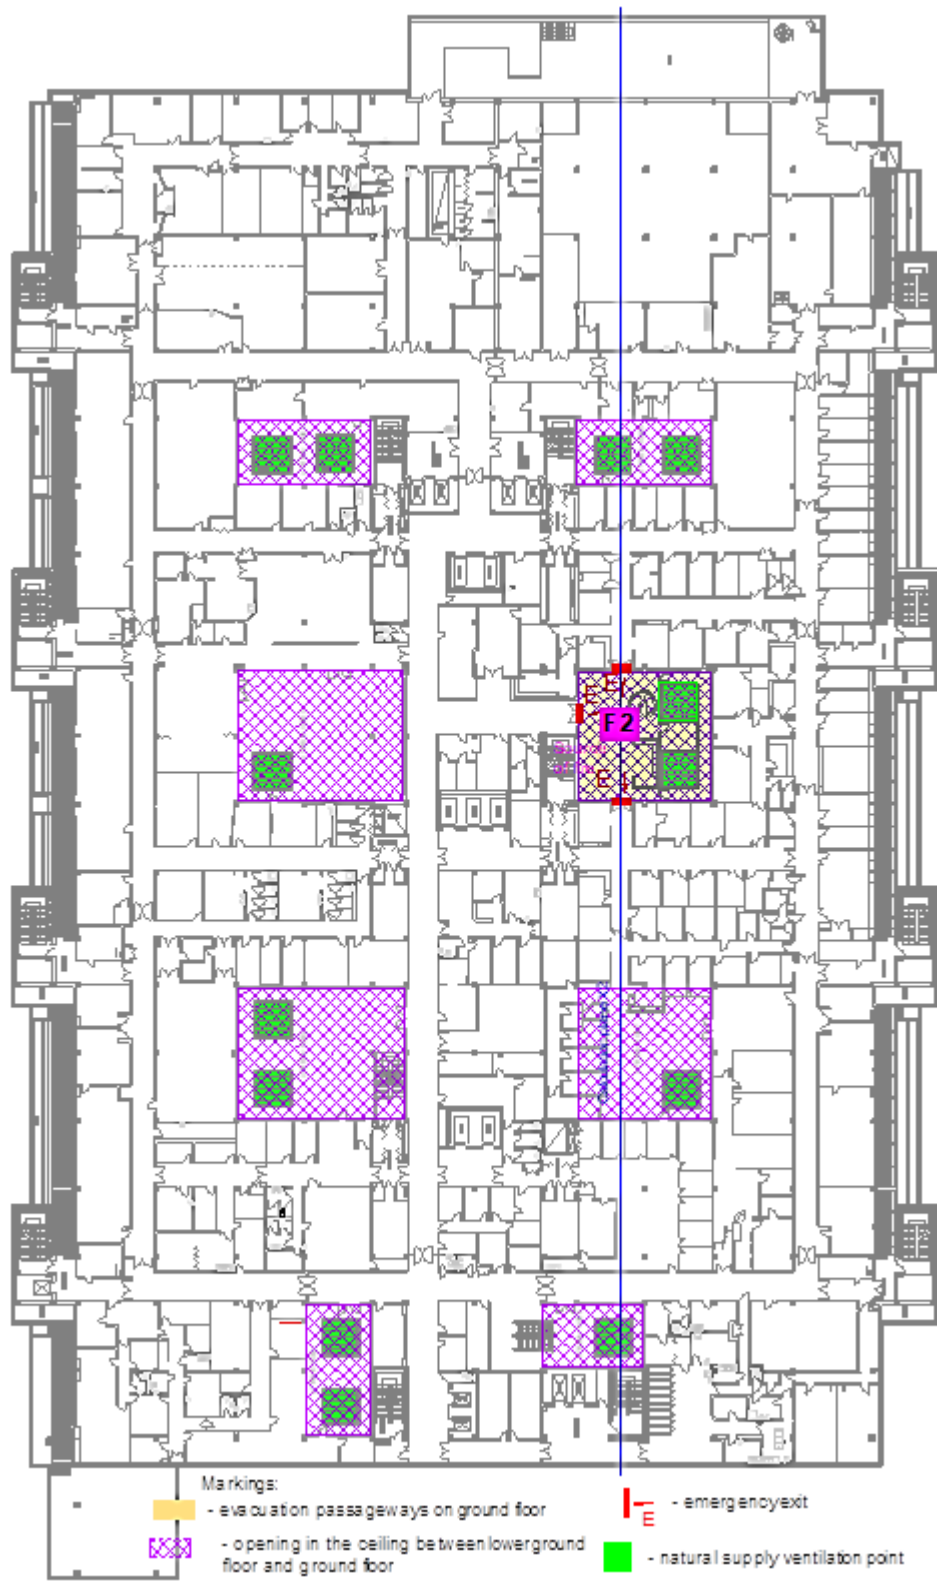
Hospital – Lower ground floor plan and design fire location F2.
